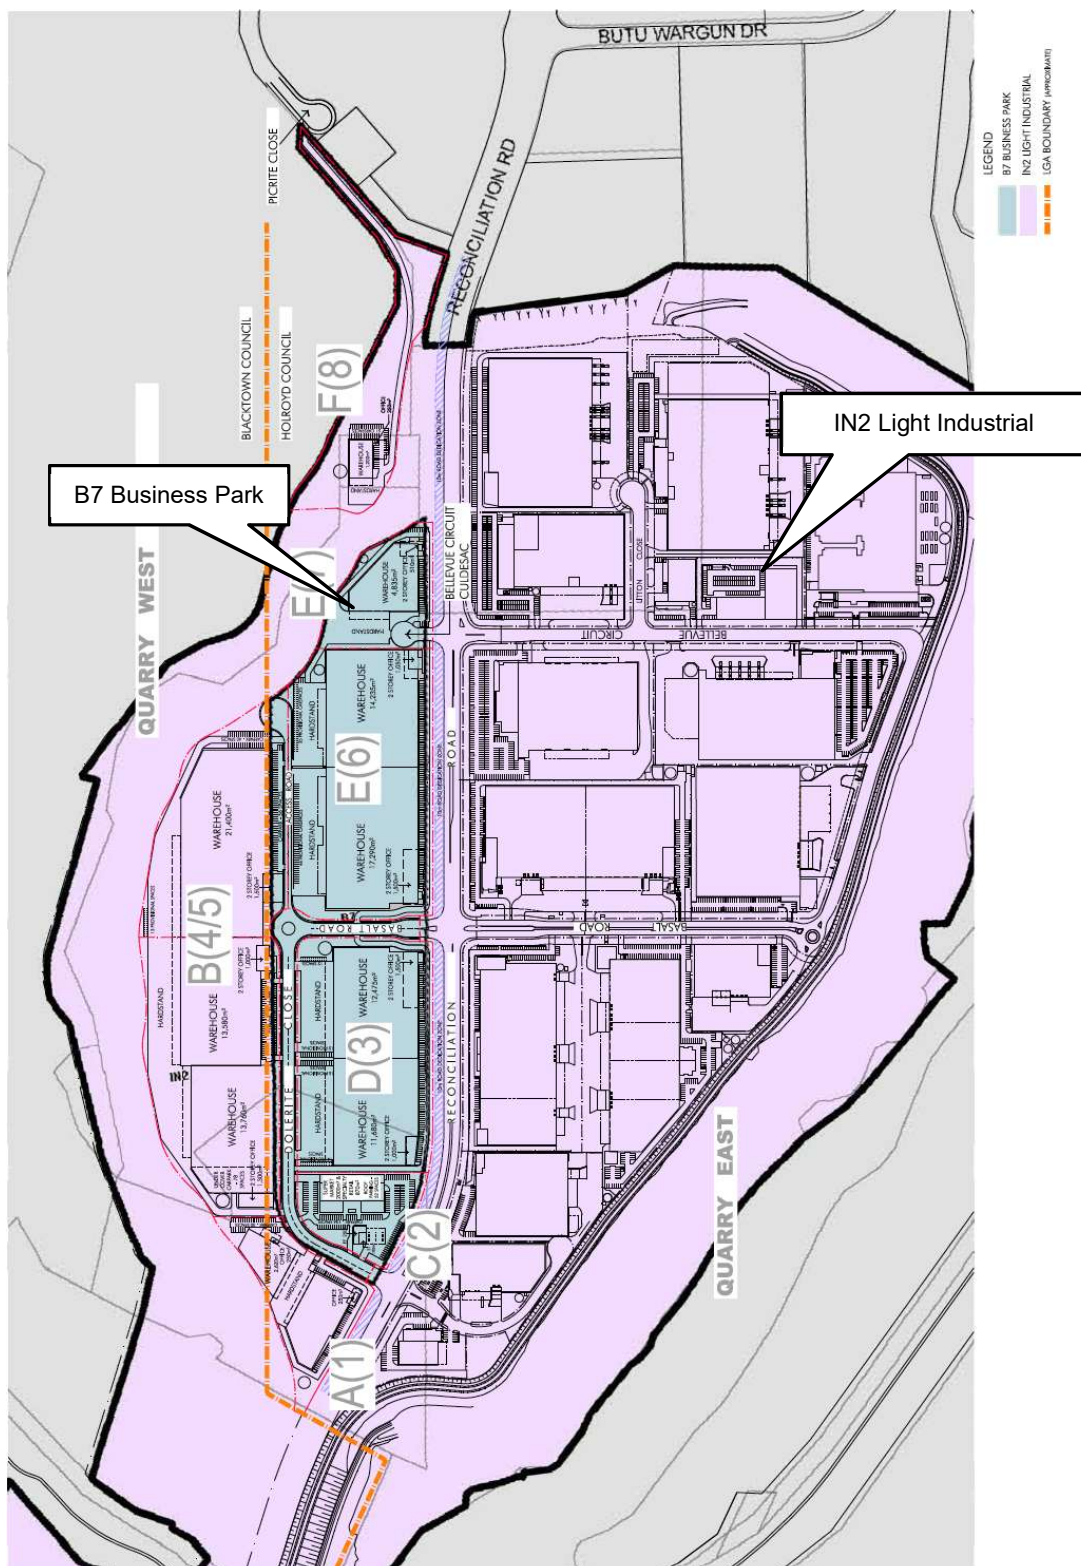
Zoning Plan (showing original masterplan layout) (Source: Nettleton Tribe)
